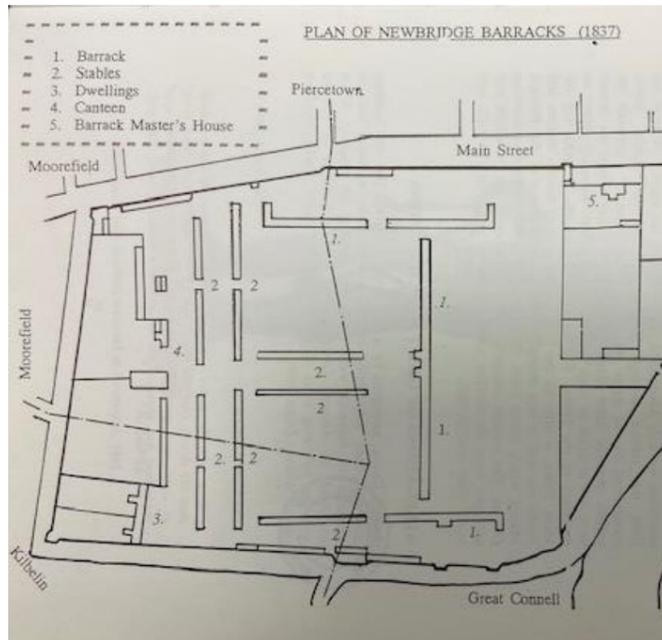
Plan of Newbridge Calvary Barracks dating to 1837.
